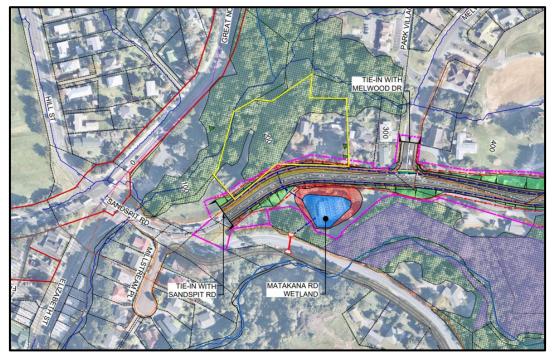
NOR4 General Arrangement Plan. 3 Matakana Road boundaries outlined in yellow.
